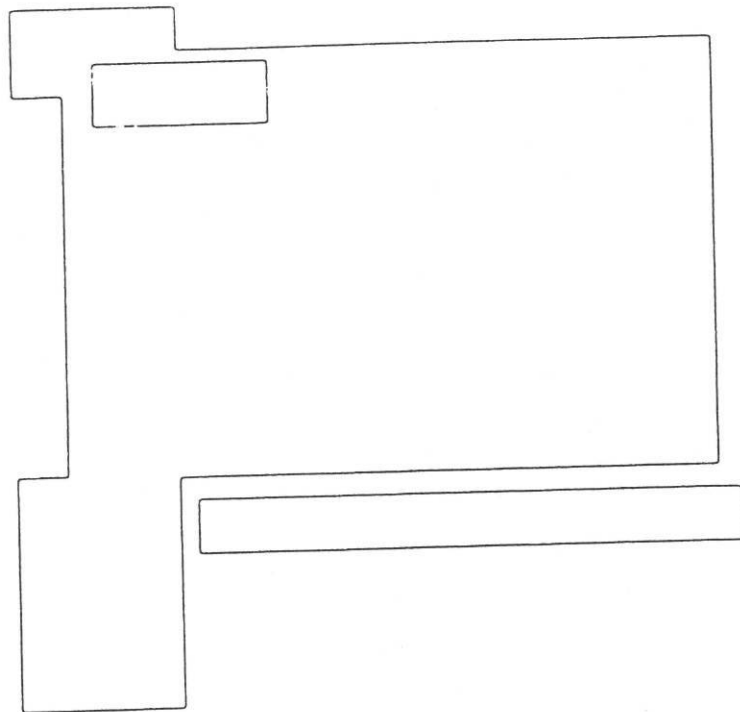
Floor Plan of Morgan Elementary School (MES) (adapted from Landman, 1996a)
